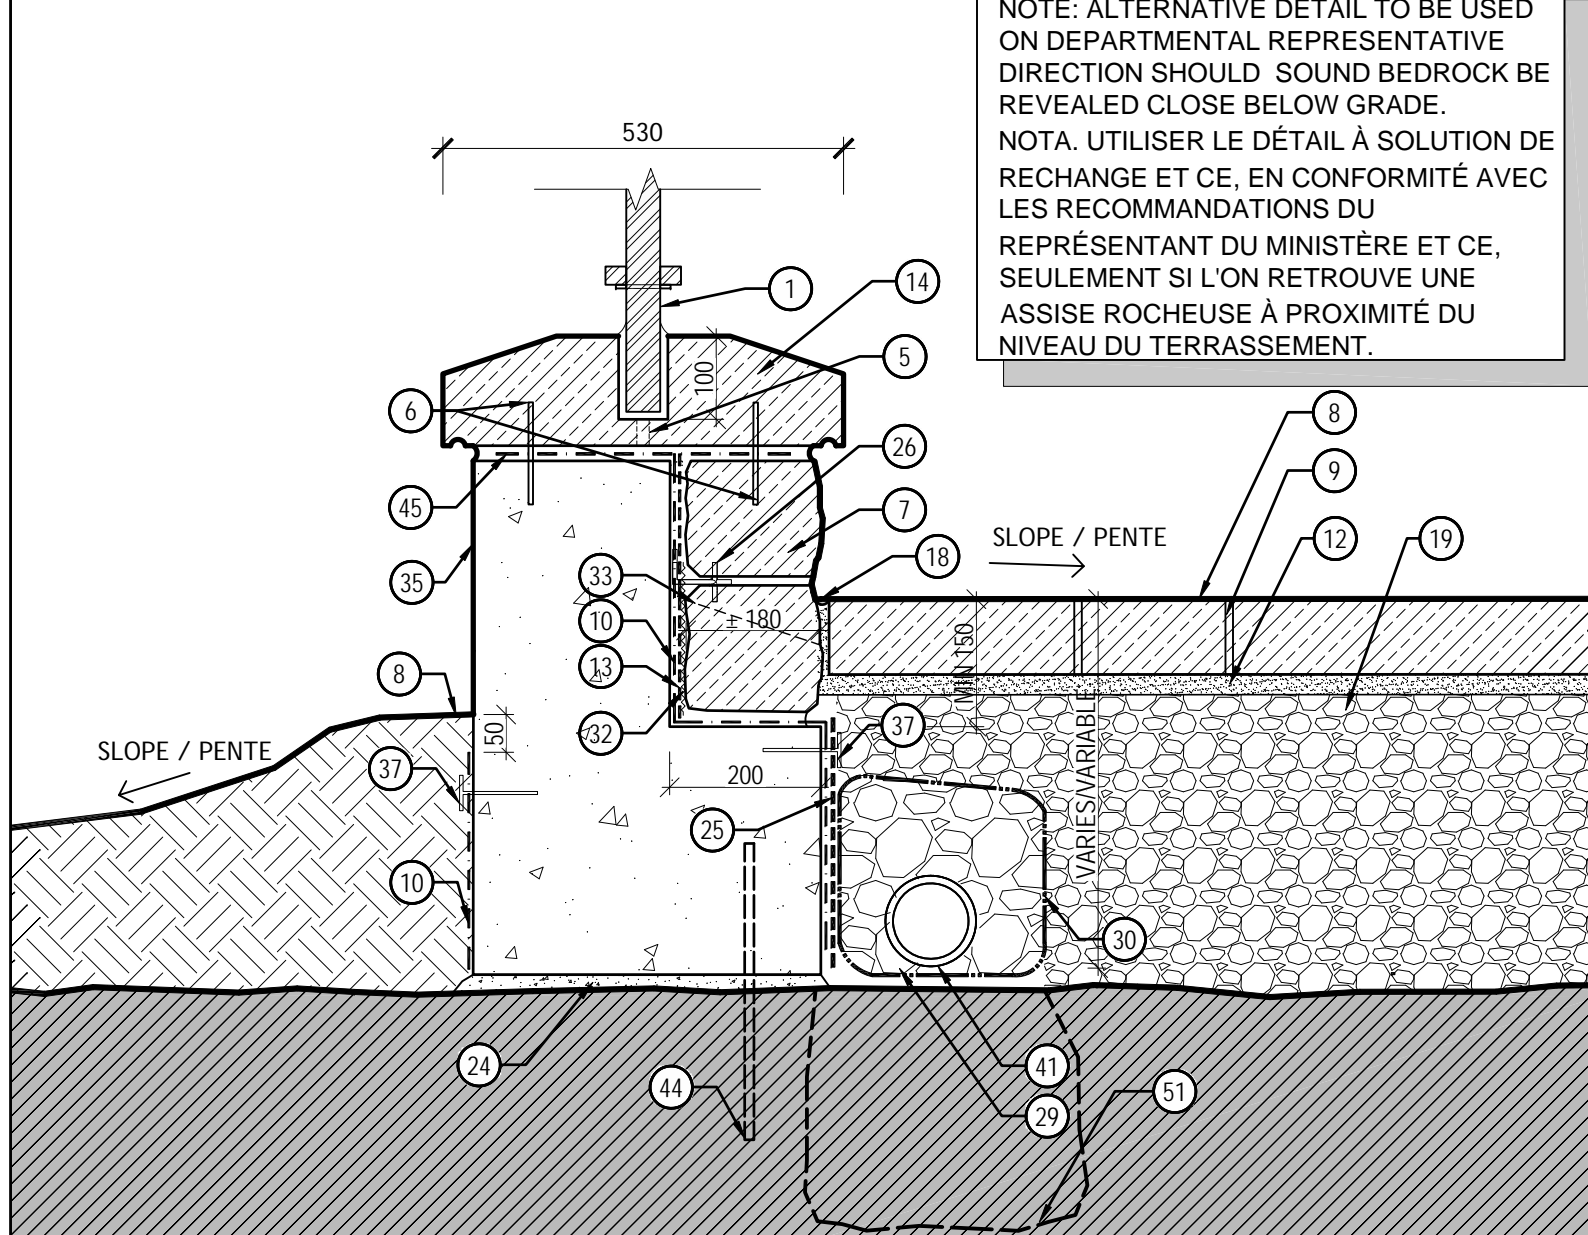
DETAIL - TYPICAL PIER SECTION DOWEL CONNECTION
